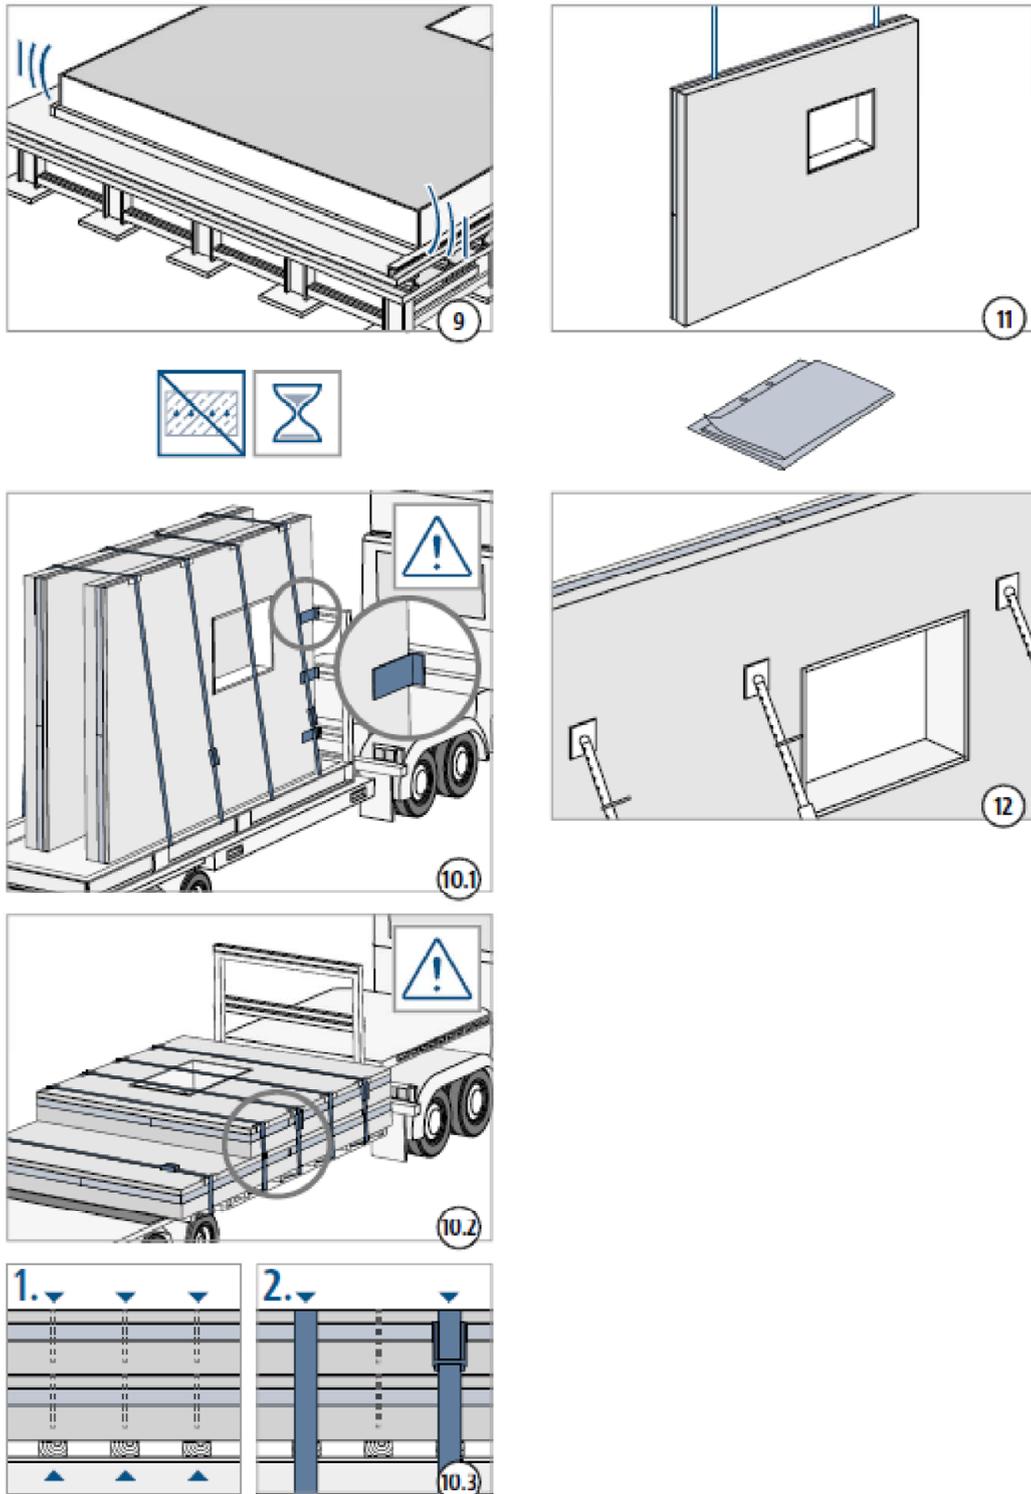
Installation instruction - Schöck Isolink® for sandwich wall – page 2
